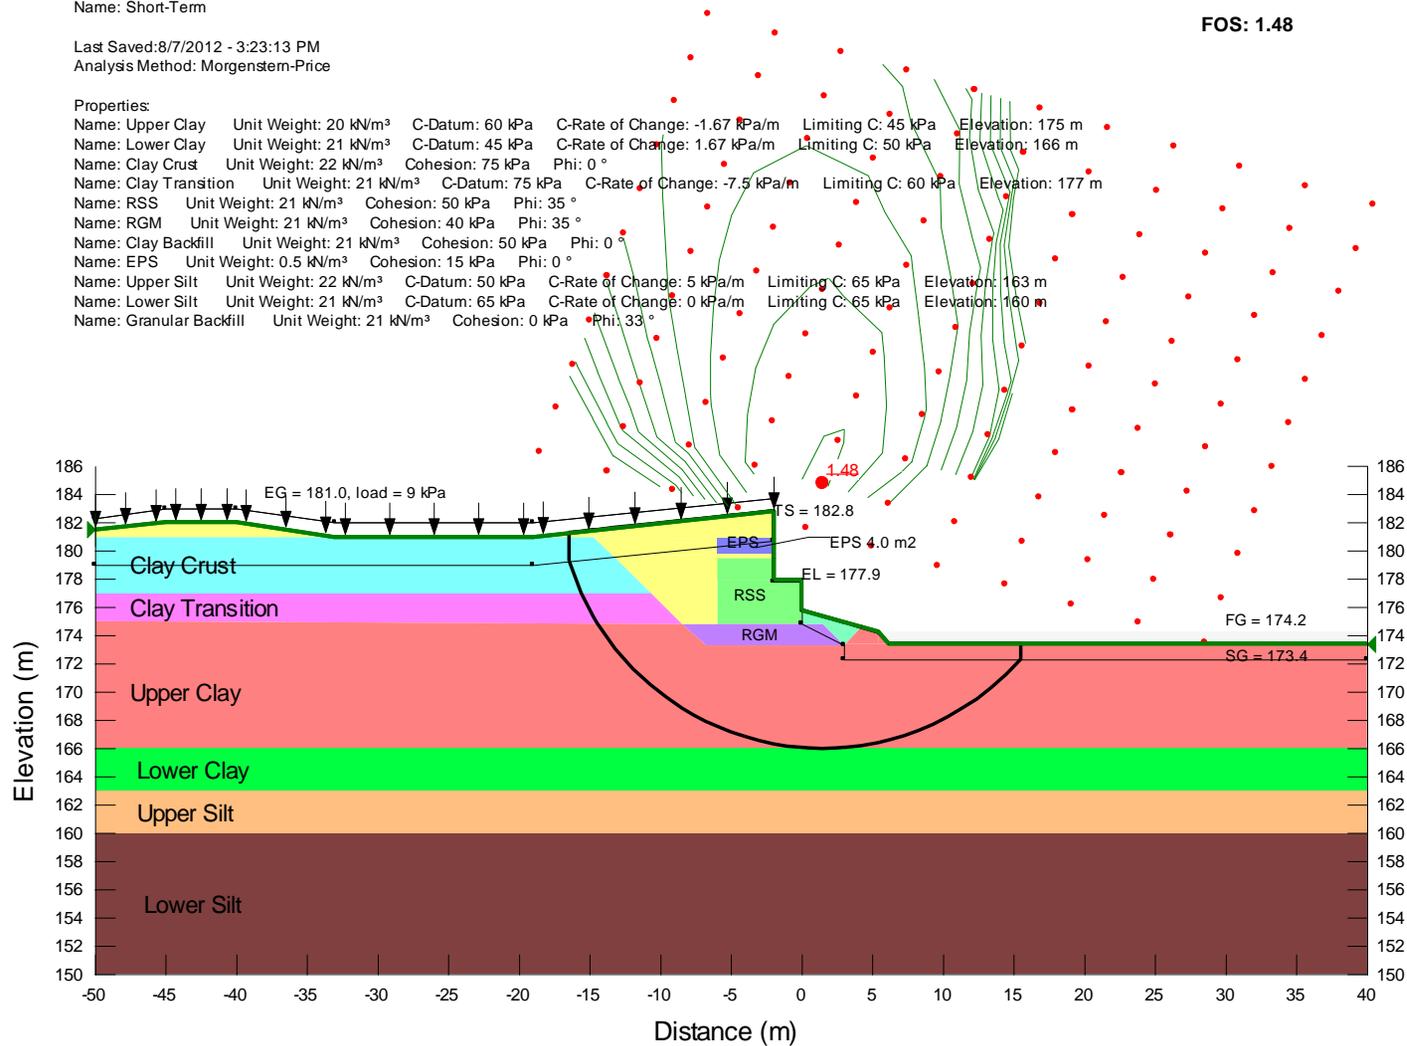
Global Stability Result – South Abutment (10+080) – End of Construction (Undrained) Loading
